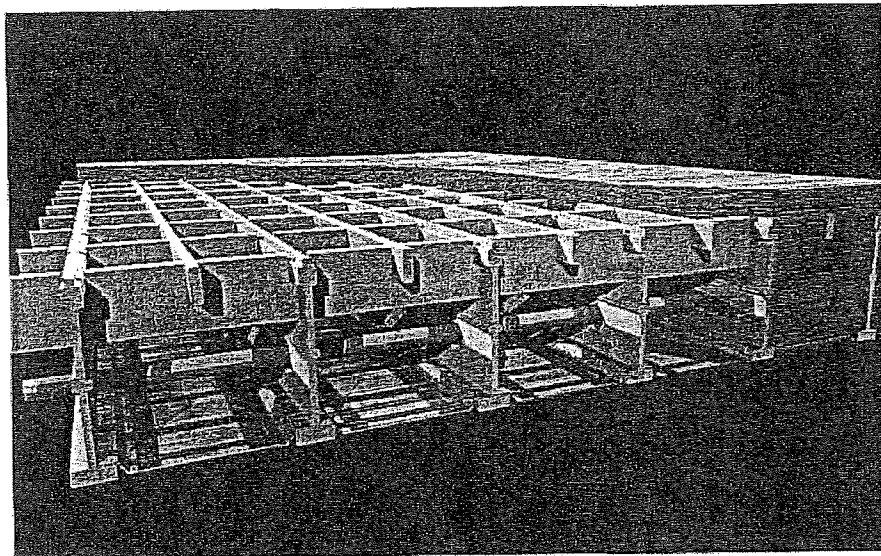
Steel Grid Panel – Full Depth Fill with Overfill
